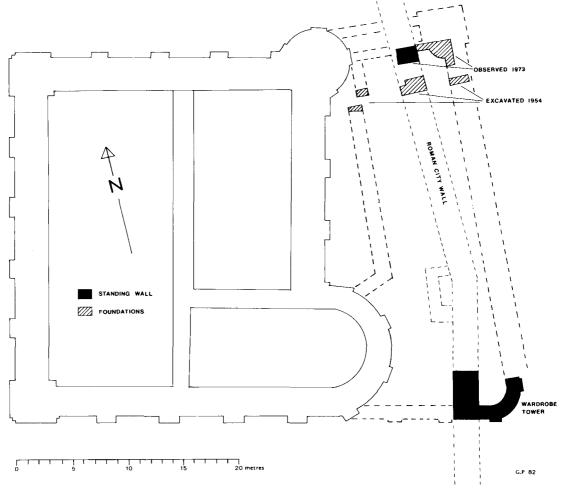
Plan of the Great Court of the Tower and the Roman city wall.
